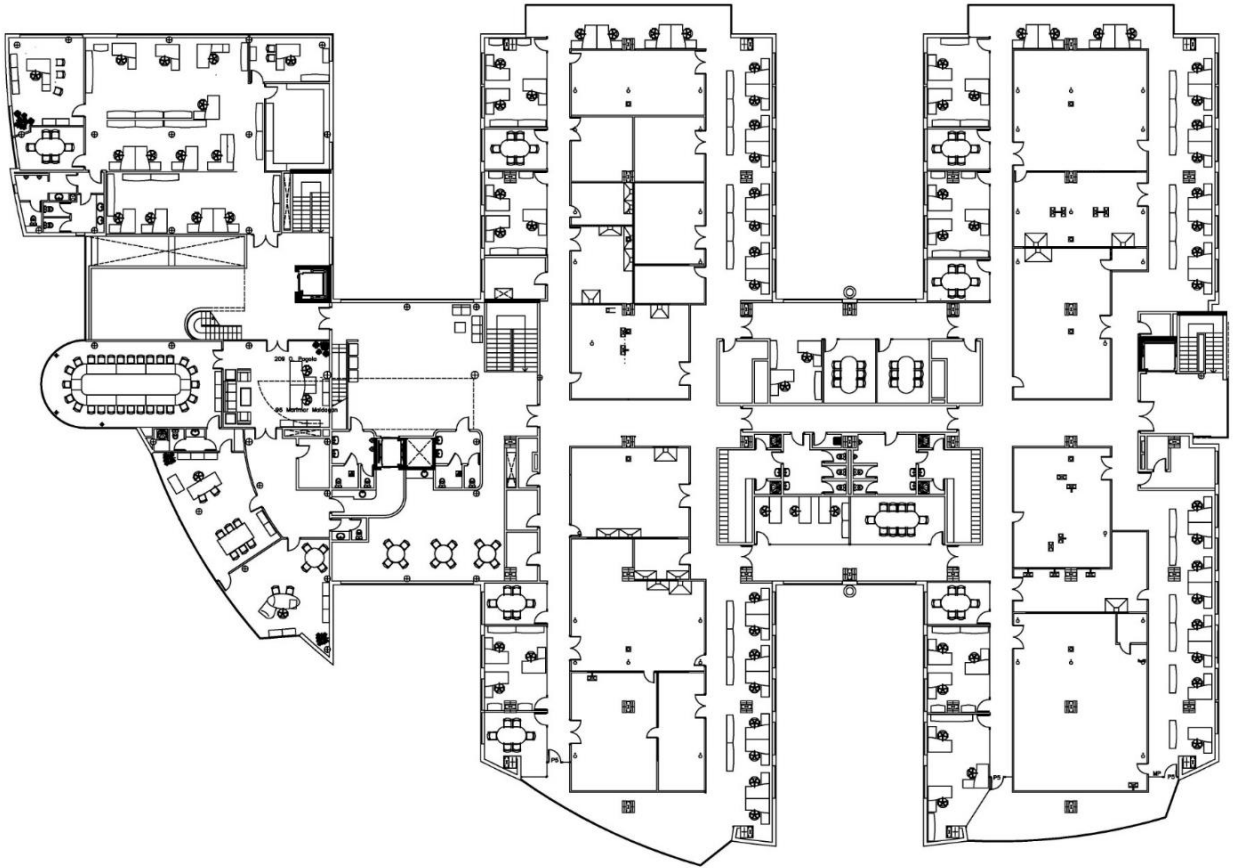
Plans of TECNALIA pilot site (2nd floor)
